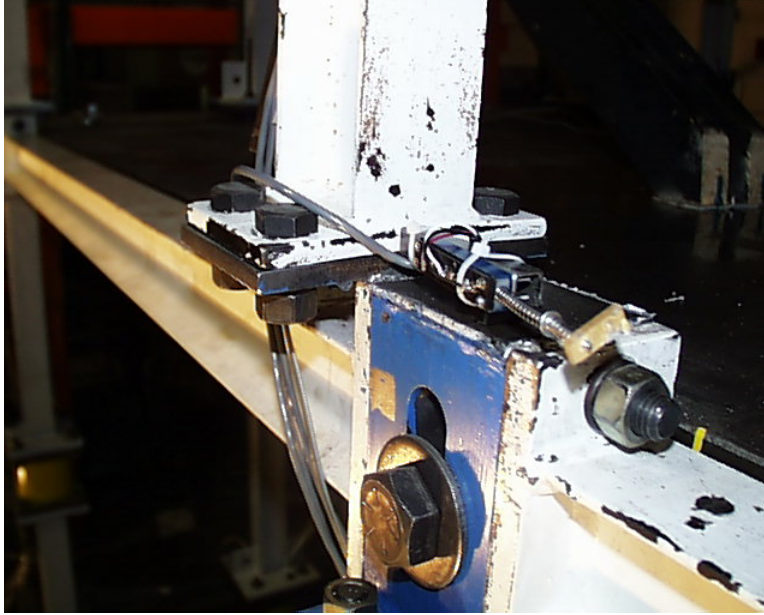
Structural Damage on Beam Column Connection – Weld Failure
